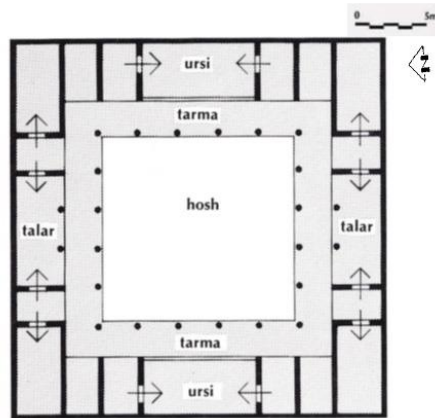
Ground floor plan in Traditional houses (Warren & Fethi 1982)
